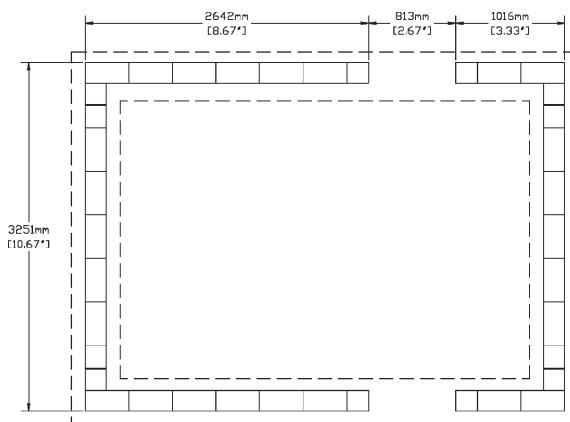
Plan view of the symmetric configuration (asymmetric not shown).
